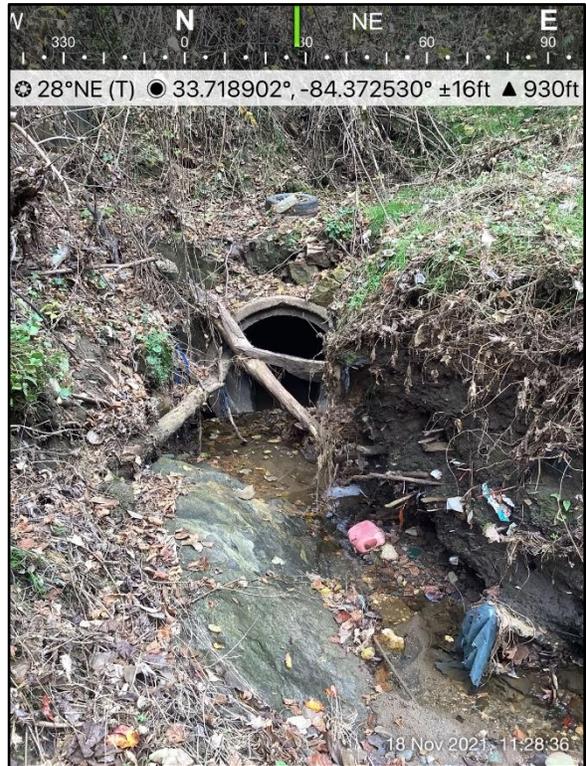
Stream 1 looking downstream at failing headwall and culvert outlet in right bank at approx. Sta. 12+40
